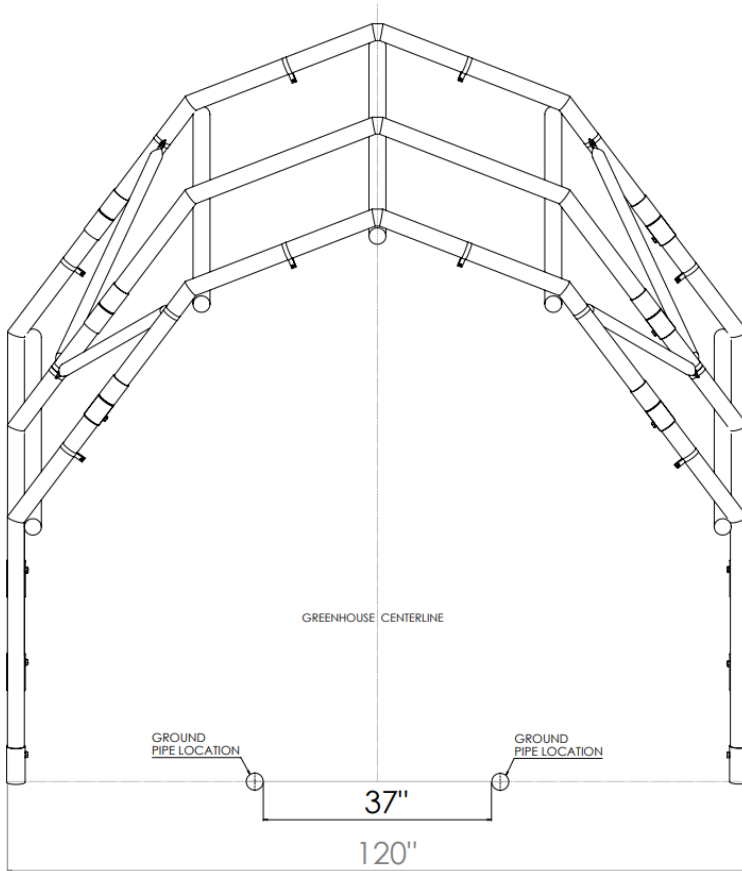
Door ground pipes will be installed to accommodate the pipes for the door assembly.
